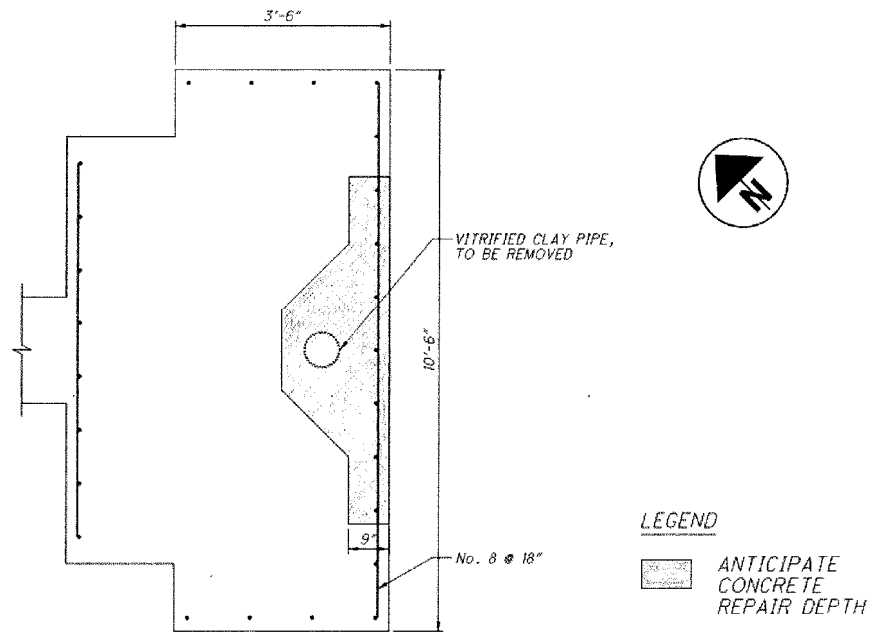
Estimated Deterioration Depth, Pier 6 South Lower Deck Pier Shaft.
